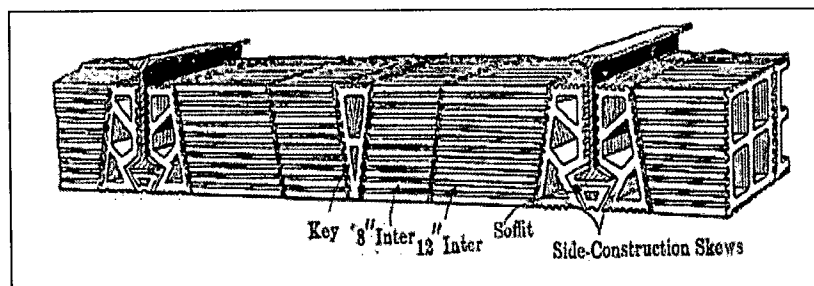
(a): Flat Clay Tile Arched Floor Systems – Type I.
